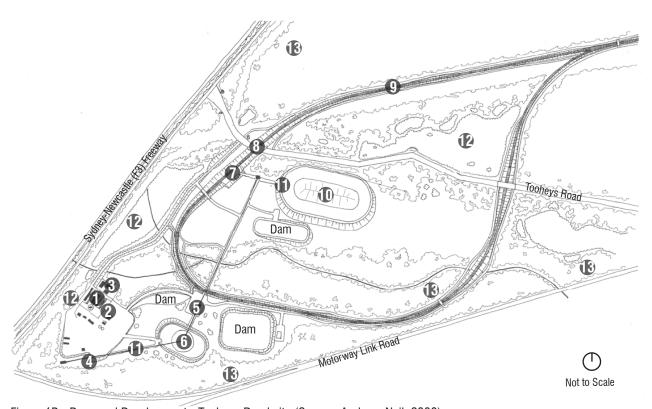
B - Proposed Development - Tooheys Road site (Source: AndrewsNeil, 2008)
